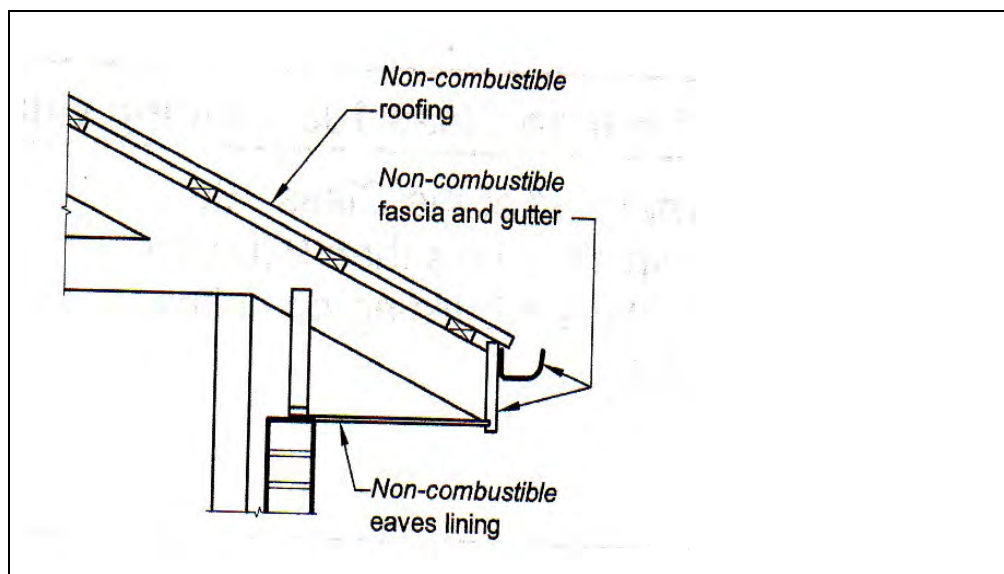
BCA eaves construction detail with an open cavity to the roof space (Source: BCA 2009 Volume 2)
